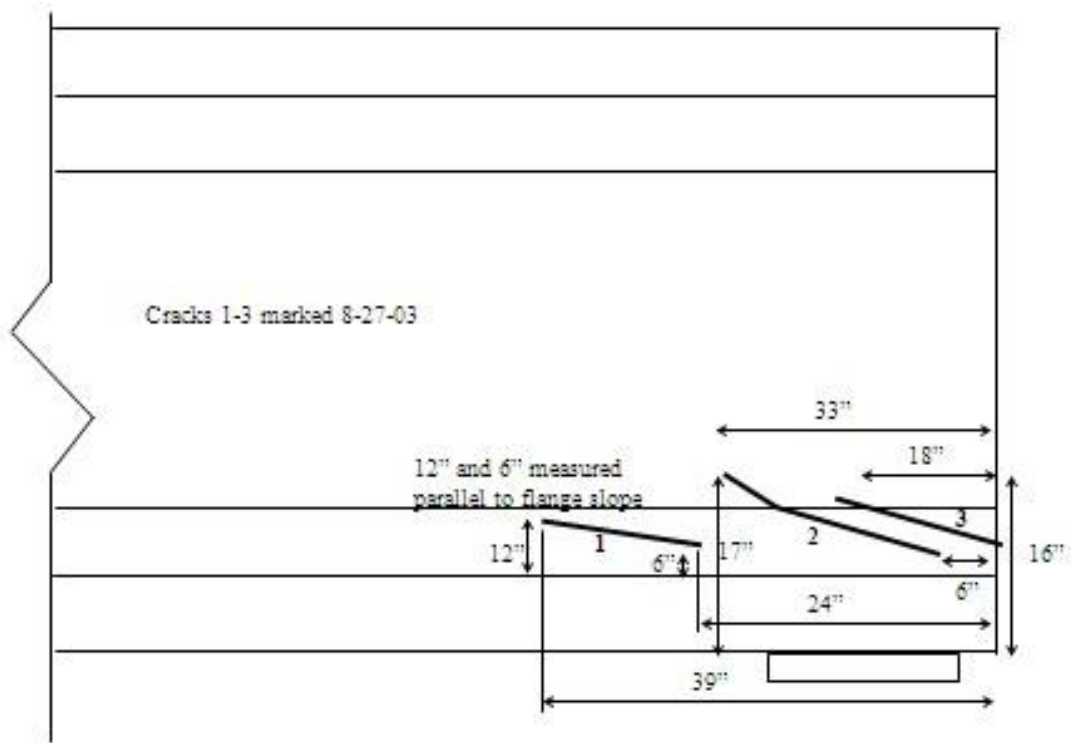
Crack diagram, exterior girder, east side, east face, north abutment (#9728).
